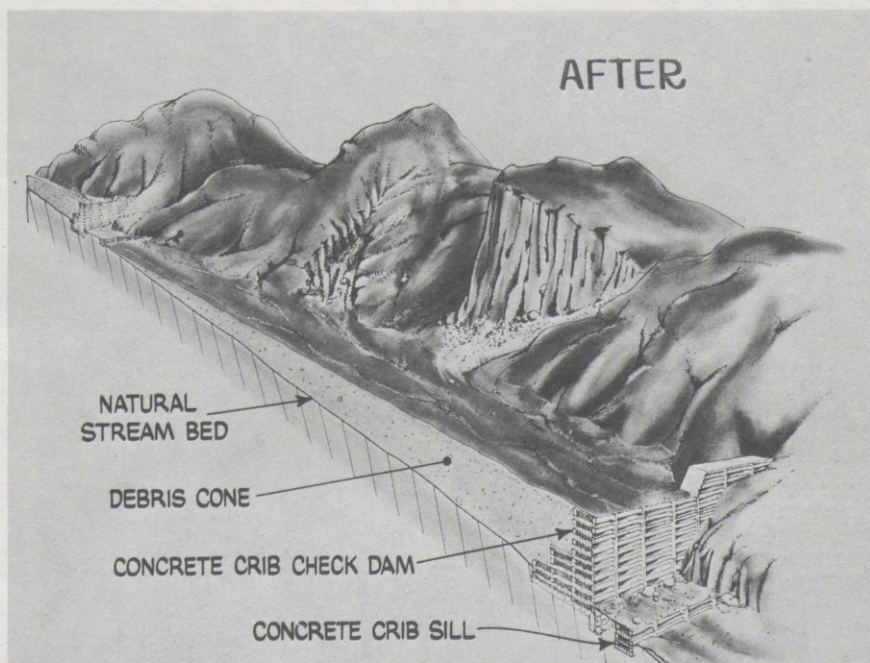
Concrete crib check dam installed in a mountain stream channel for stabilizing stream beds and sides as well as trapping debris.
